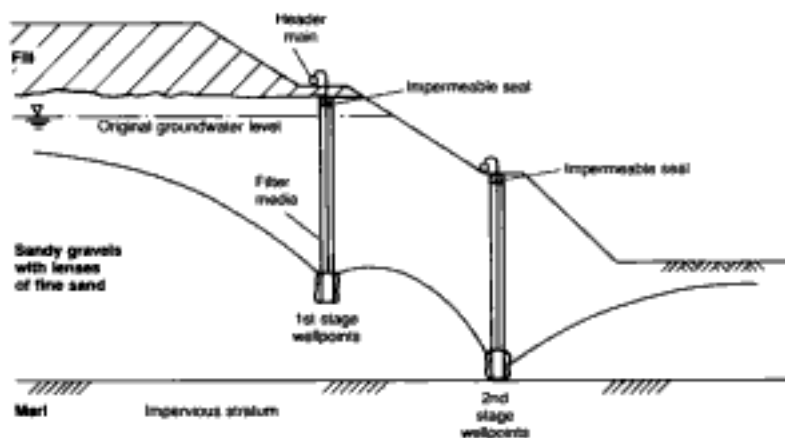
Cross-section of a large open excavation showing typical wellpoint installation applied in two stages
